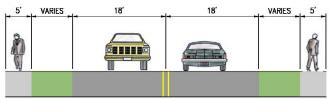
Roadway typical section seen along Pine Street from Locust Street to Maple Street
